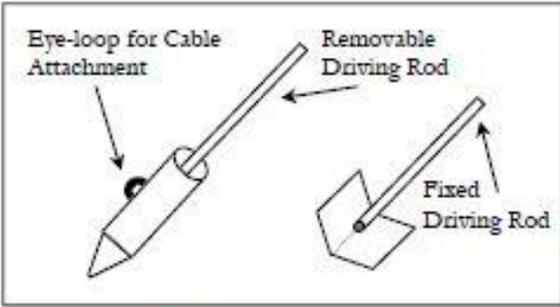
A. Earth Anchor. A metal plate or cylindrical tube that pivots on an attached anchoring rod or cable. The loaded anchor planes sideways against undisturbed soil to provide holding strength.
